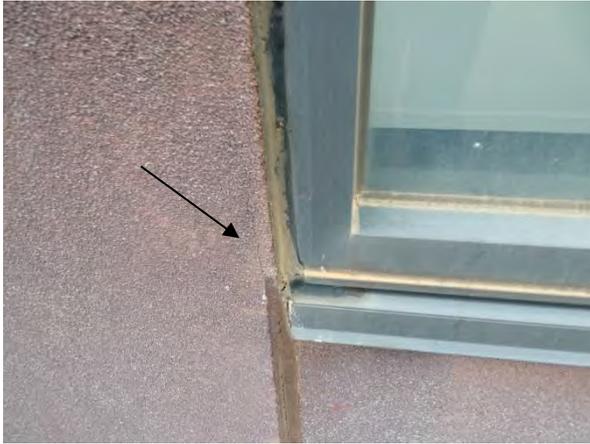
Joints in the sheet can be seen through the thin render coat and the sheets have been installed horizontally.
